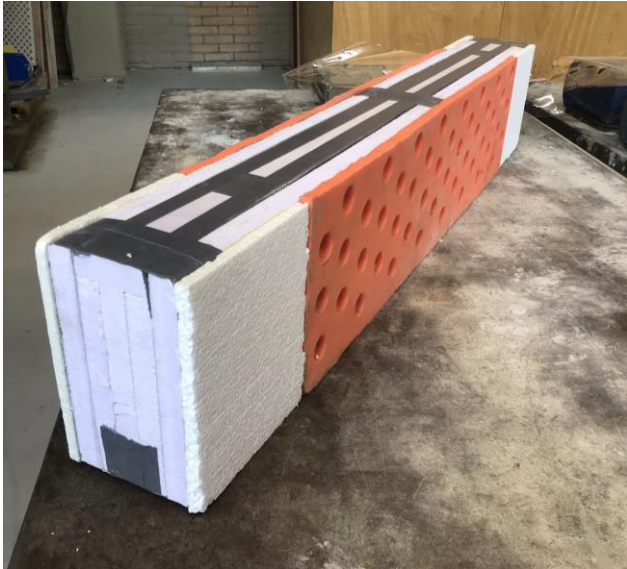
Inner mould for the precast SHCC U-shaped formwork.
